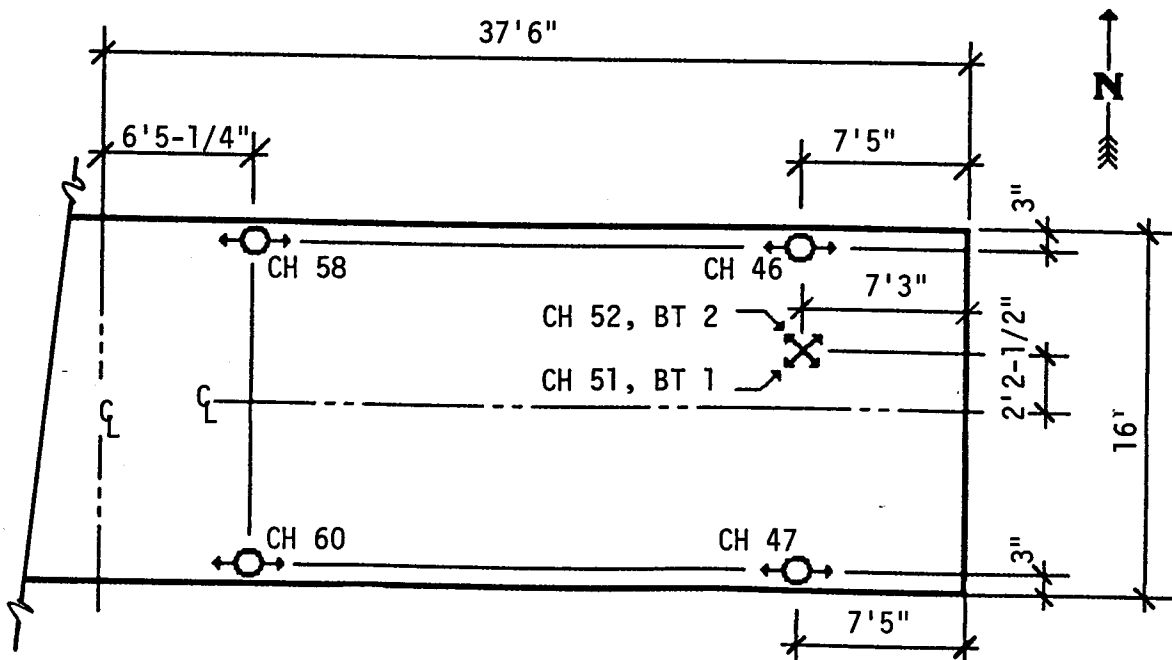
Concrete Strain Gage Layout-Bottom Plan
